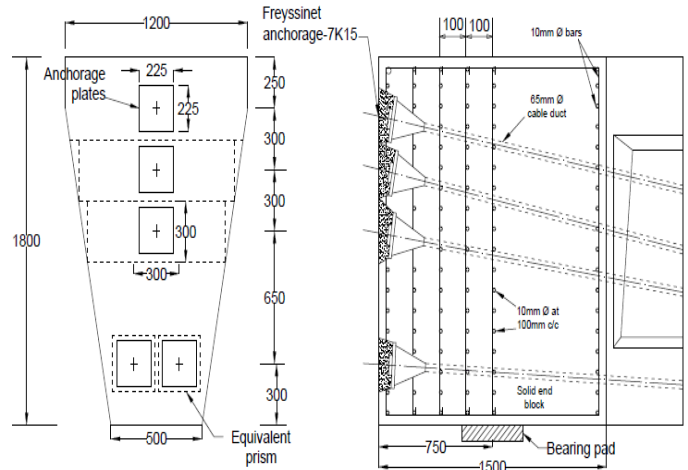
Equivalent prisms and anchorage zone reinforcement (for effective span 30m)
